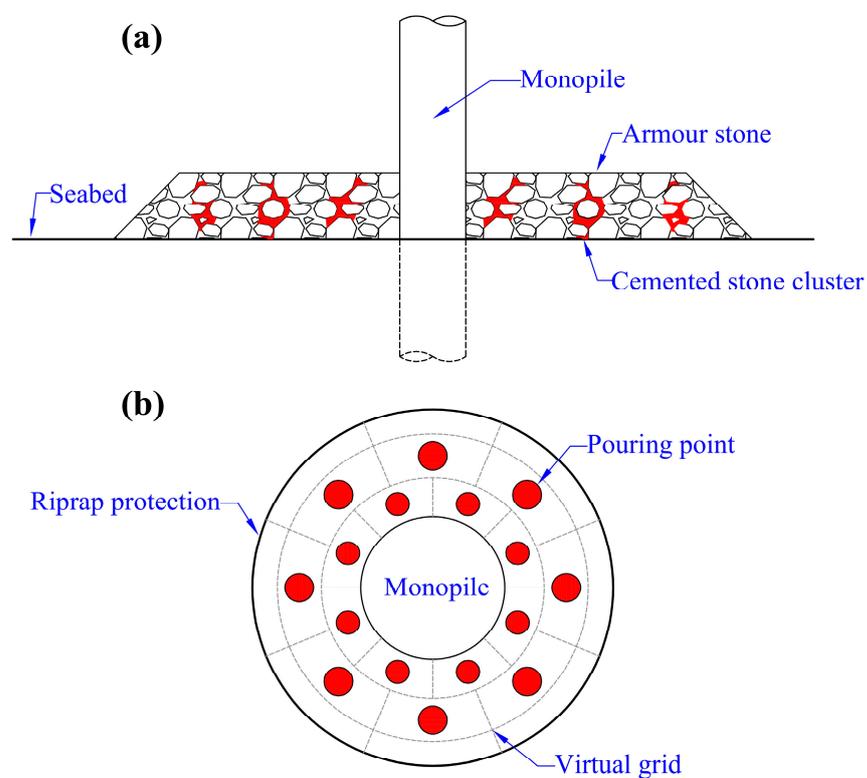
Grid grouting strategy of gridded cemented riprap (GCRP) (adapted from reference [33]): (a) Schematic of GCRP (b) Pouring point layout of cementitious grout at the surface of riprap.
